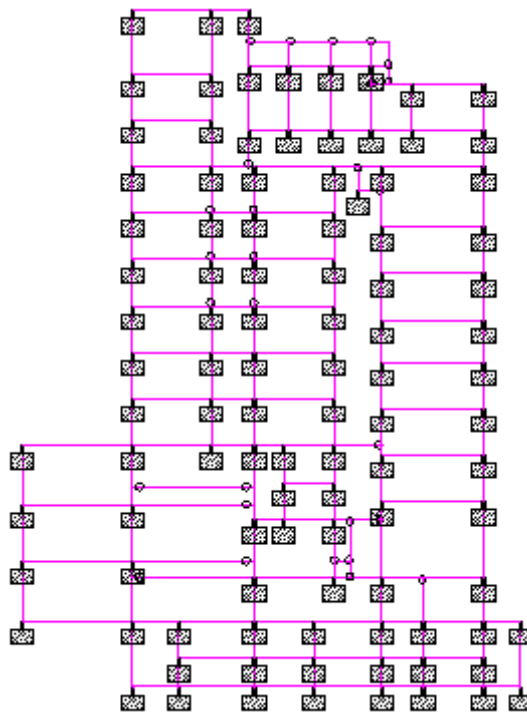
STAAD Model of Hospital Building (without diaphragm) in Plan view
